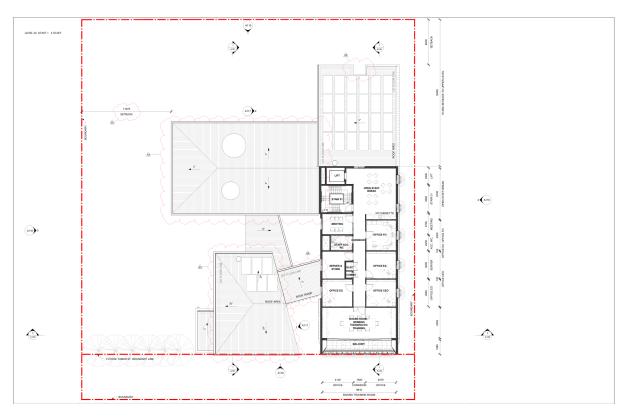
Level 2 Floor Plan. Source: Kaunitz Yeung Architecture
